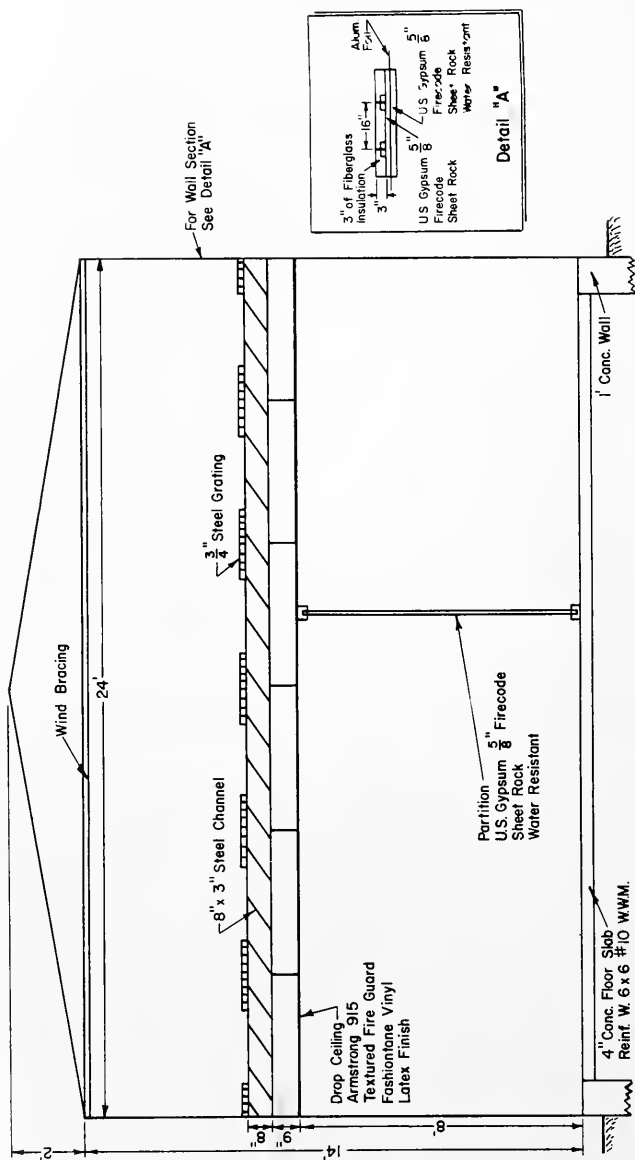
EAST-WEST SECTION THROUGH EXPERIMENTAL STRUCTURE
